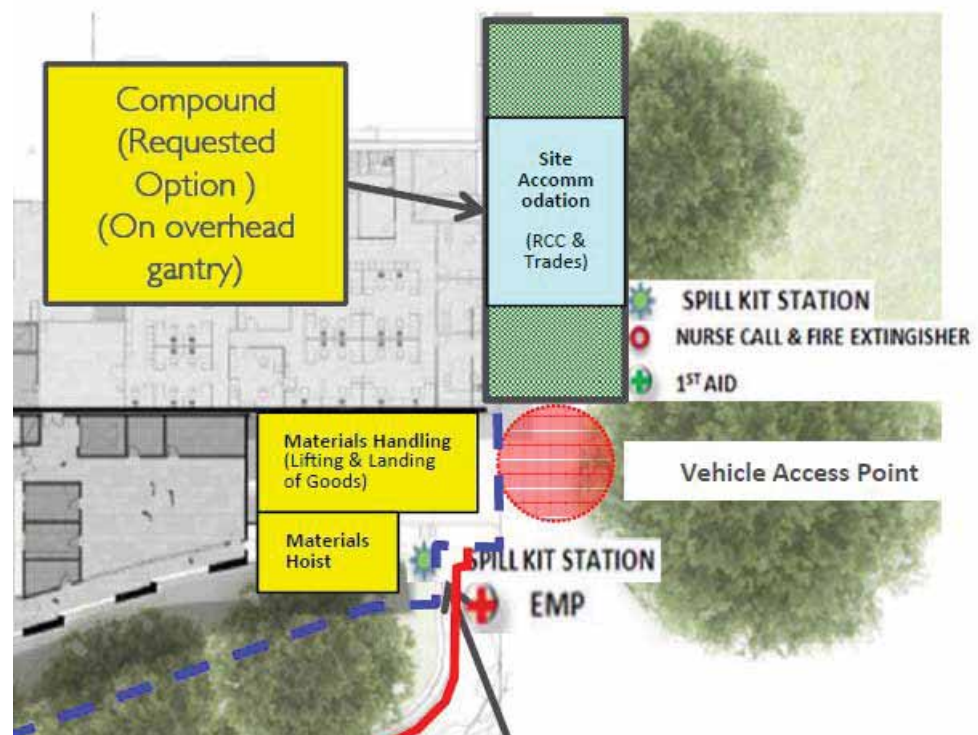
Site Establishment (Barff Road) - Site Accommodation
